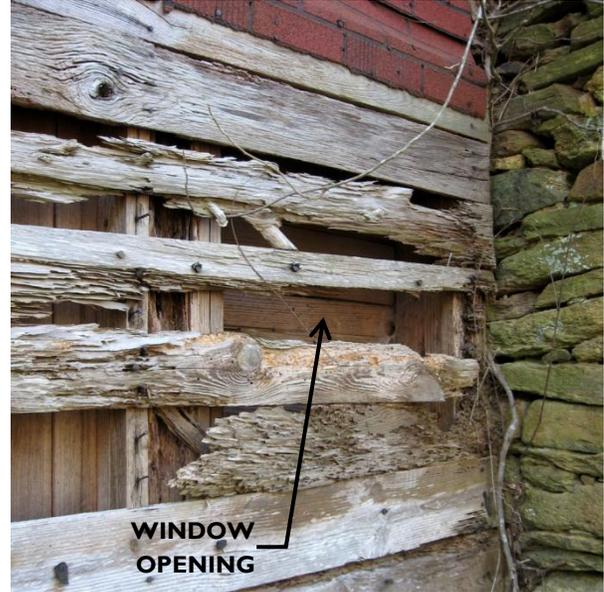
Tenant House. Detail of rough sheathing at east wall. Note sheathing covers original window opening.
